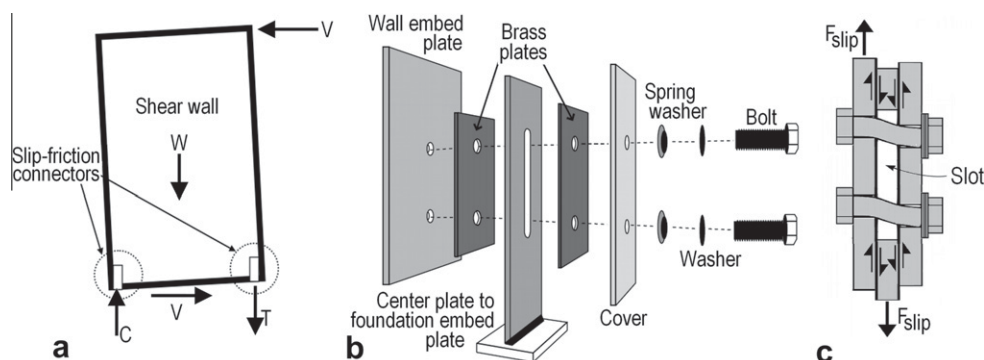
Slip-friction connectors with shear walls: (a) capping of lateral force on shear wall, (b) connector assemblage for pre-cast concrete wall (courtesy of the Precast/Prestressed Concrete Institute [3]), and (c) activated friction forces.
